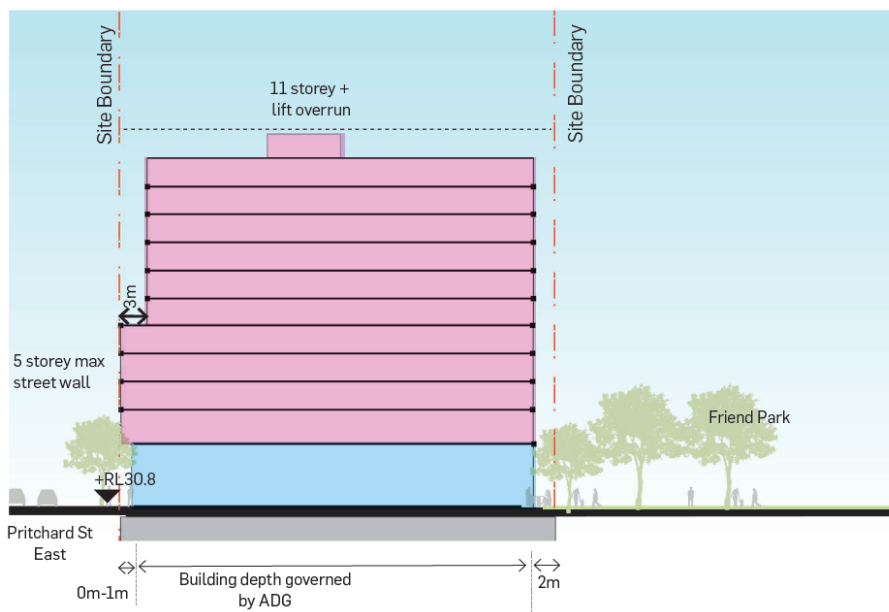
Section D-D through corner of Pritchard Street and Station Street Precinct (typical north – south tower section)
